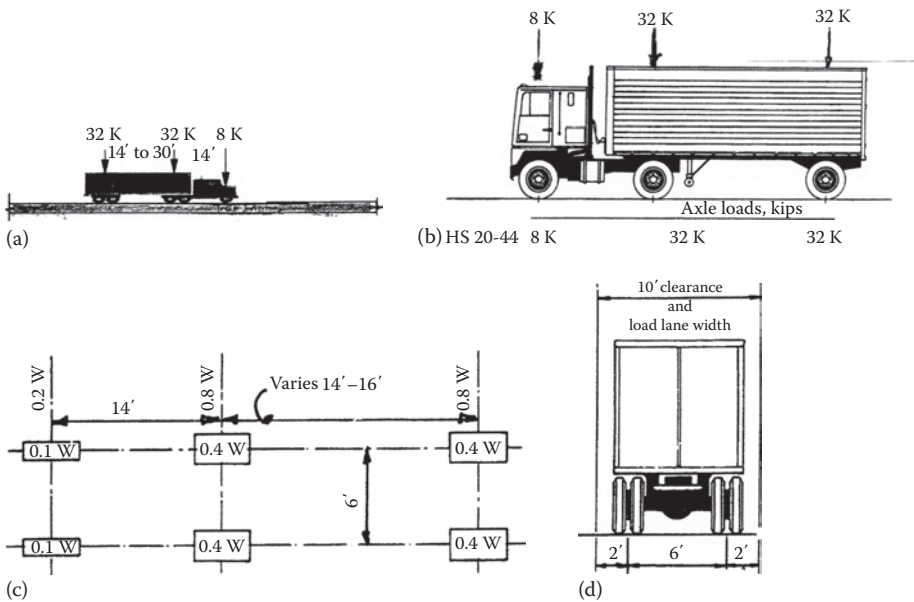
(a–d) Standard HS20-44 truck loading for highway bridges.
